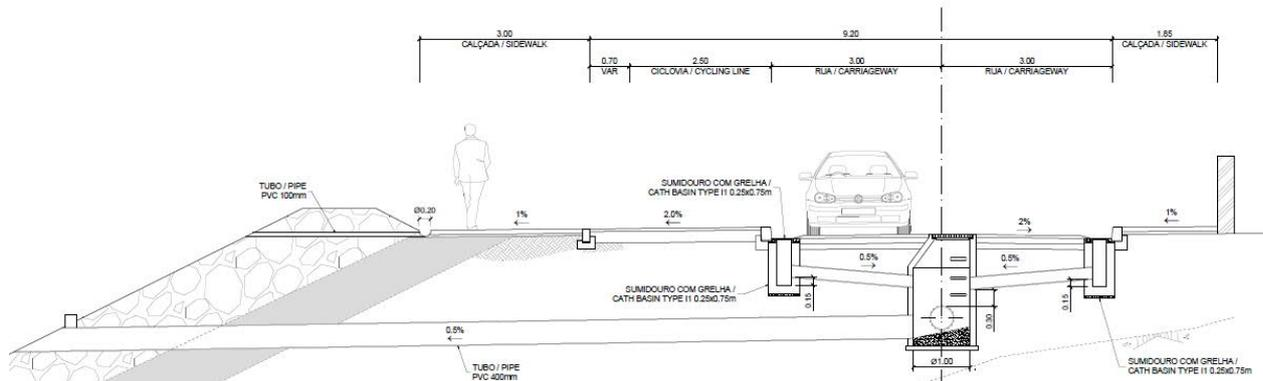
Typical section Pantufo Coastline (5+900 – 6+460, 6+600 – 6+940, 7+100 – 7+370 and 7+630 – 7+680).
